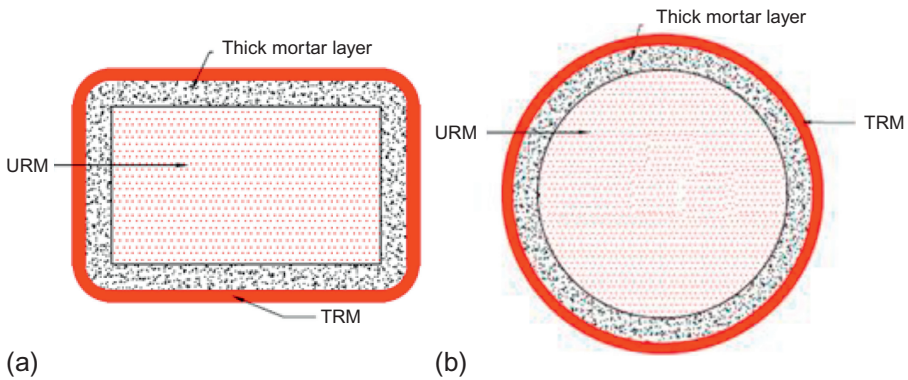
Confinement of (a) a rectangular masonry column and (b) a circular masonry column.
